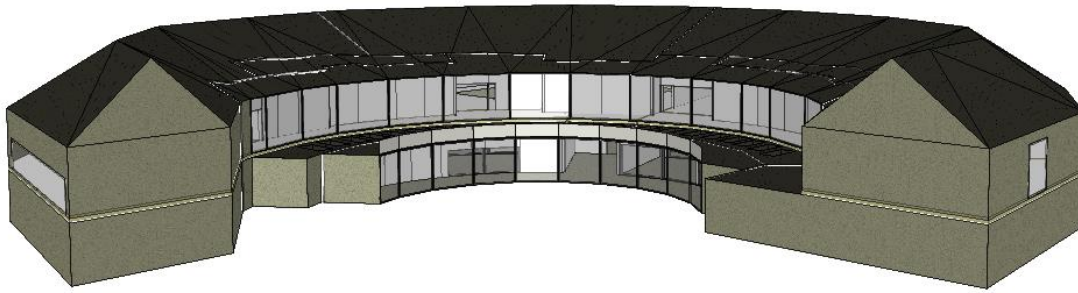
Illustration of the curtain walls on the inner perimeter of the building
